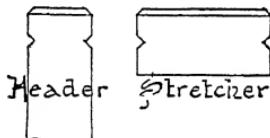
Concrete Blocks for Scarborough Sea-wall.
